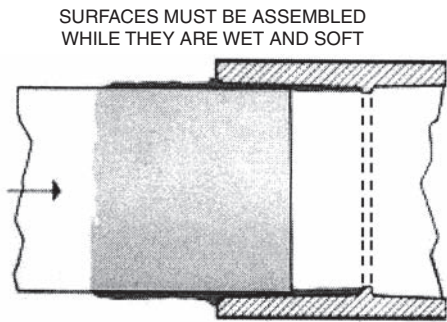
C: Solvent cement joint being assembled. Surfaces must be assembled while they are wet and soft. Courtesy NIBCO, Inc.
